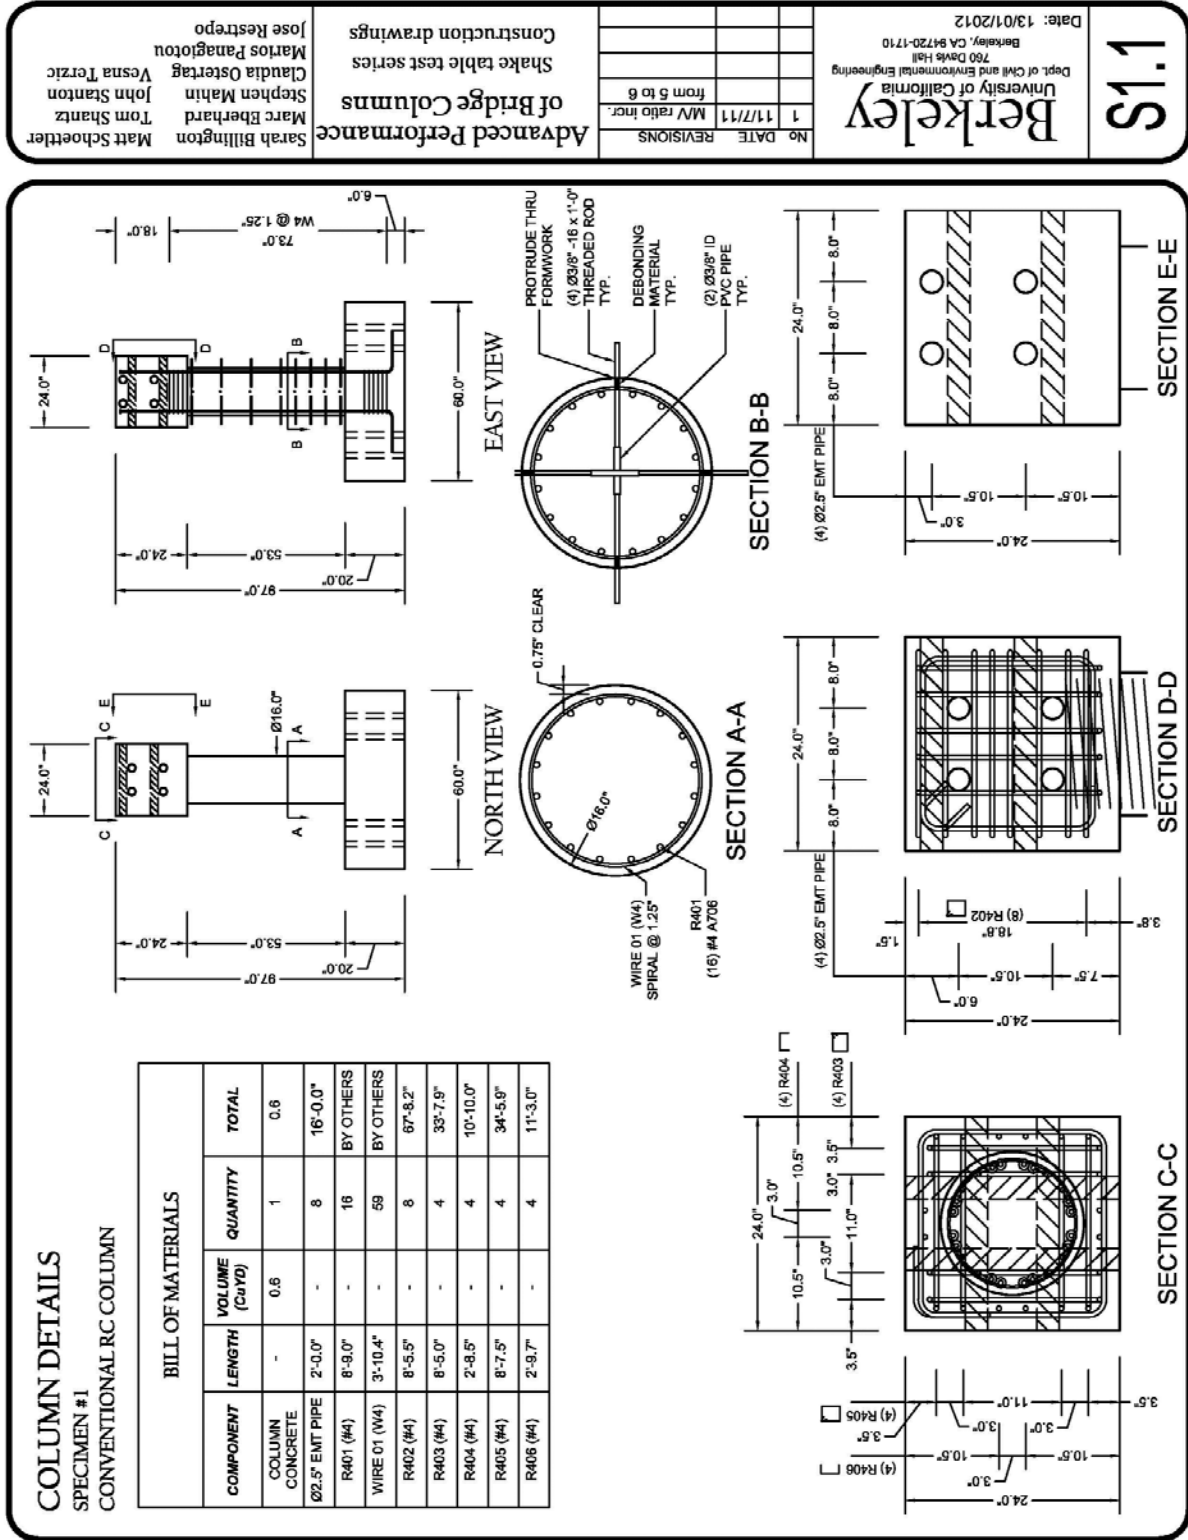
Reinforcement for column load stubs and footings (cont.).
